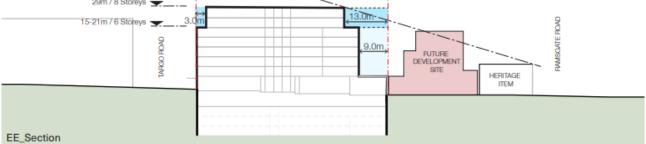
Building Height (in storeys), setbacks and street wall heights – sections
